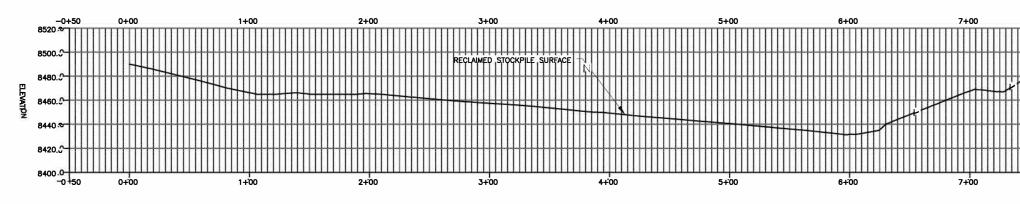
WORK AREA SITE PLAN - 1E AUGUST 2018
